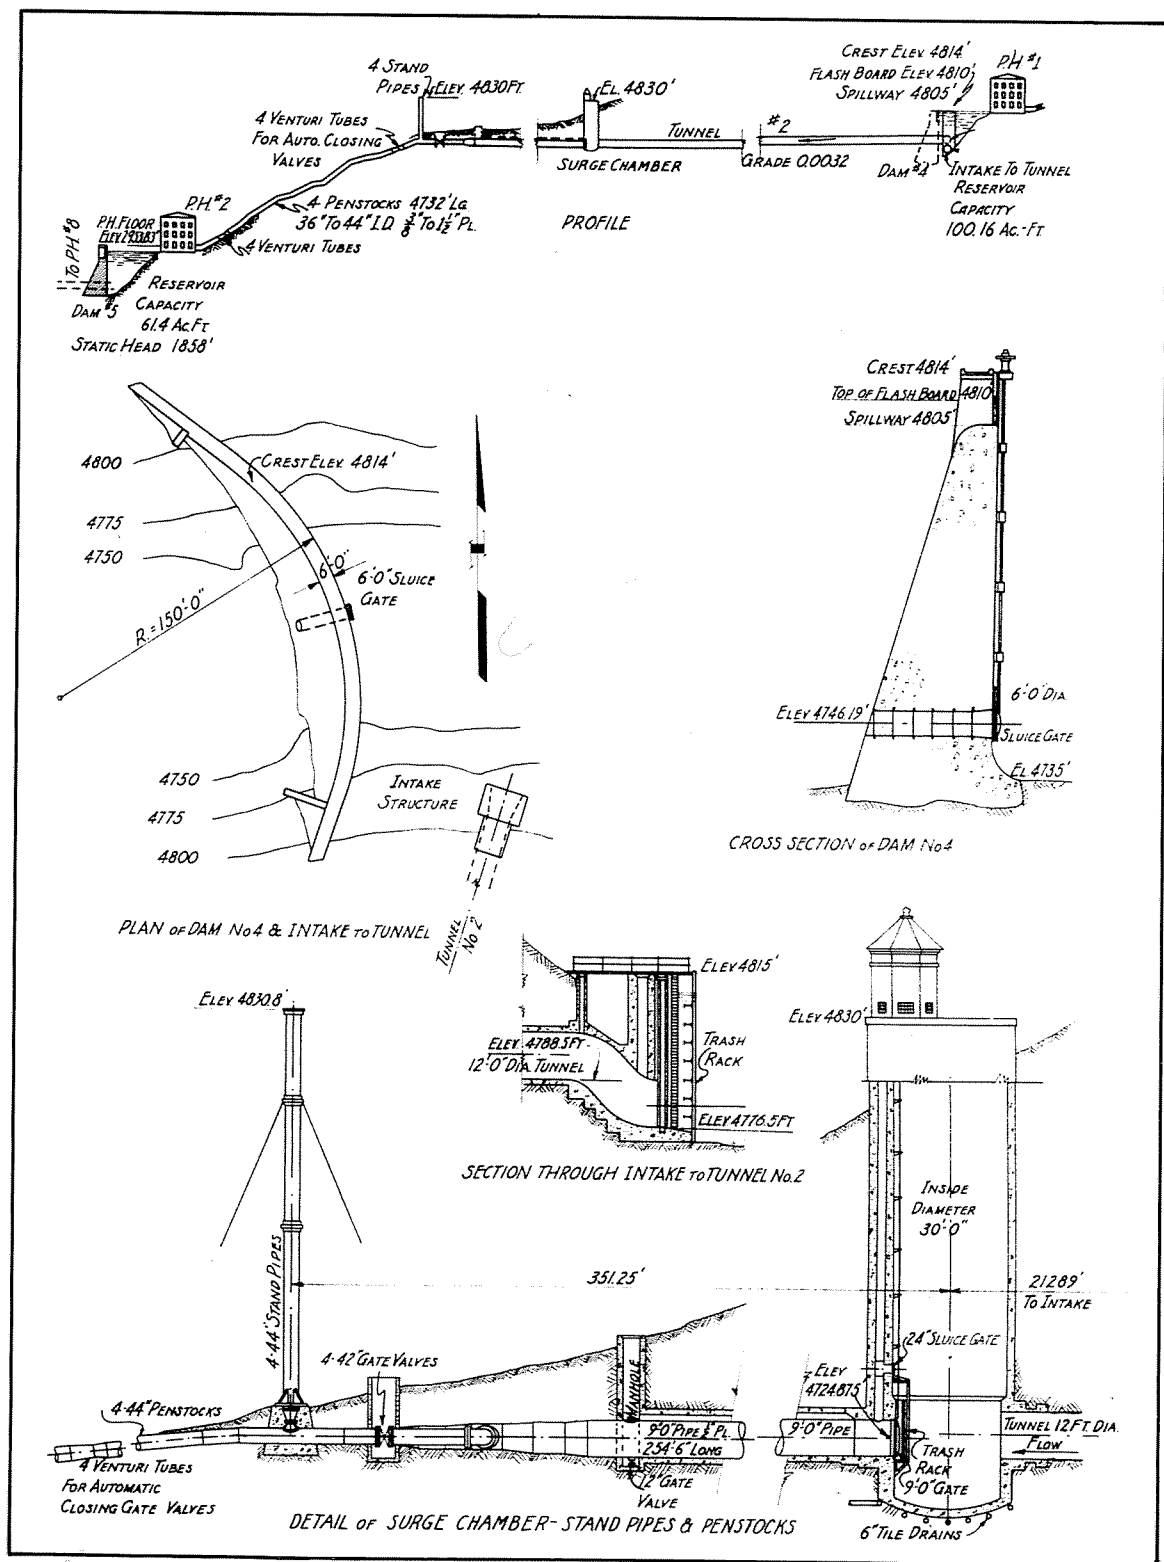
Figure B Powerhouse No. 2 hydraulic plan with details of Dam No. 4, Tunnel No. 2, intake and standpipes (SCE 1928b:B10-3).
